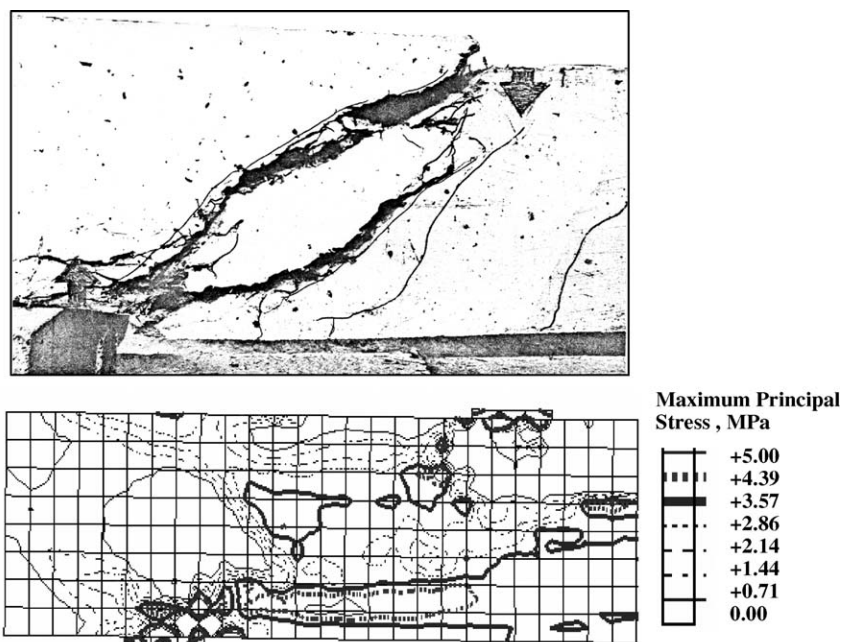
Shear failure and stress contour of beam 4/0.5.
